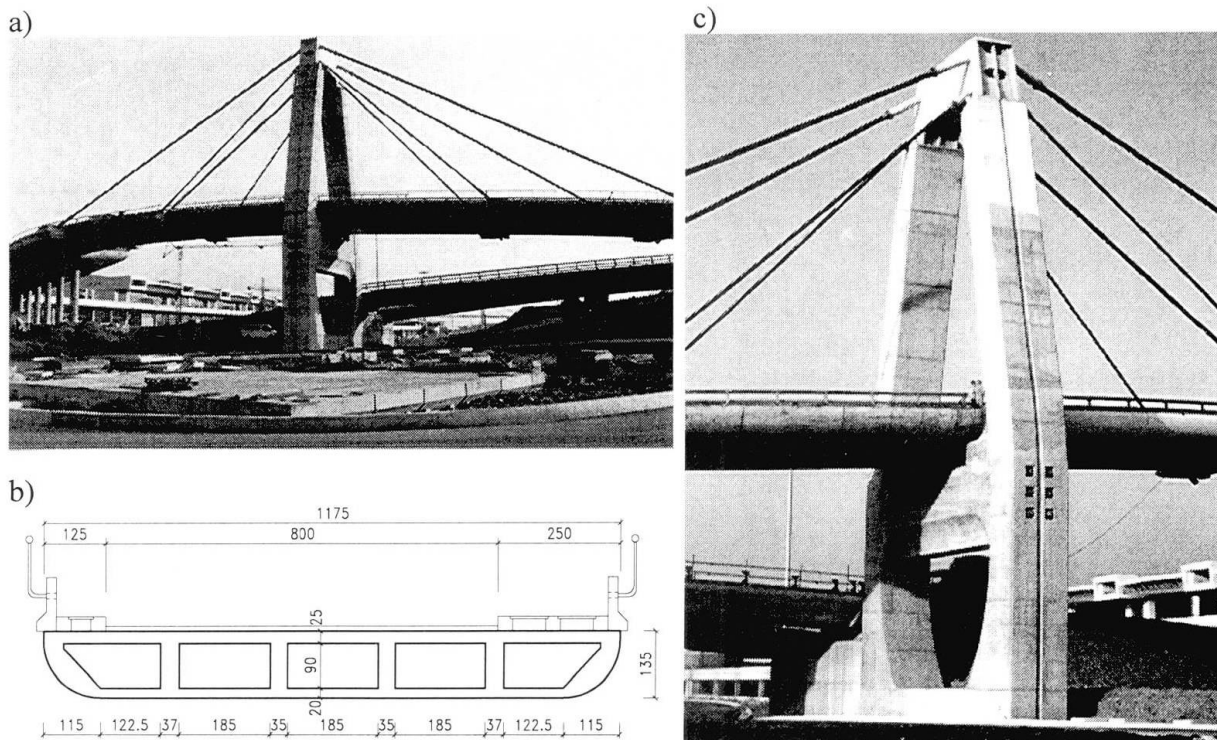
a) View of the north-side bridge; b) Cross-section; c) View of the tower
